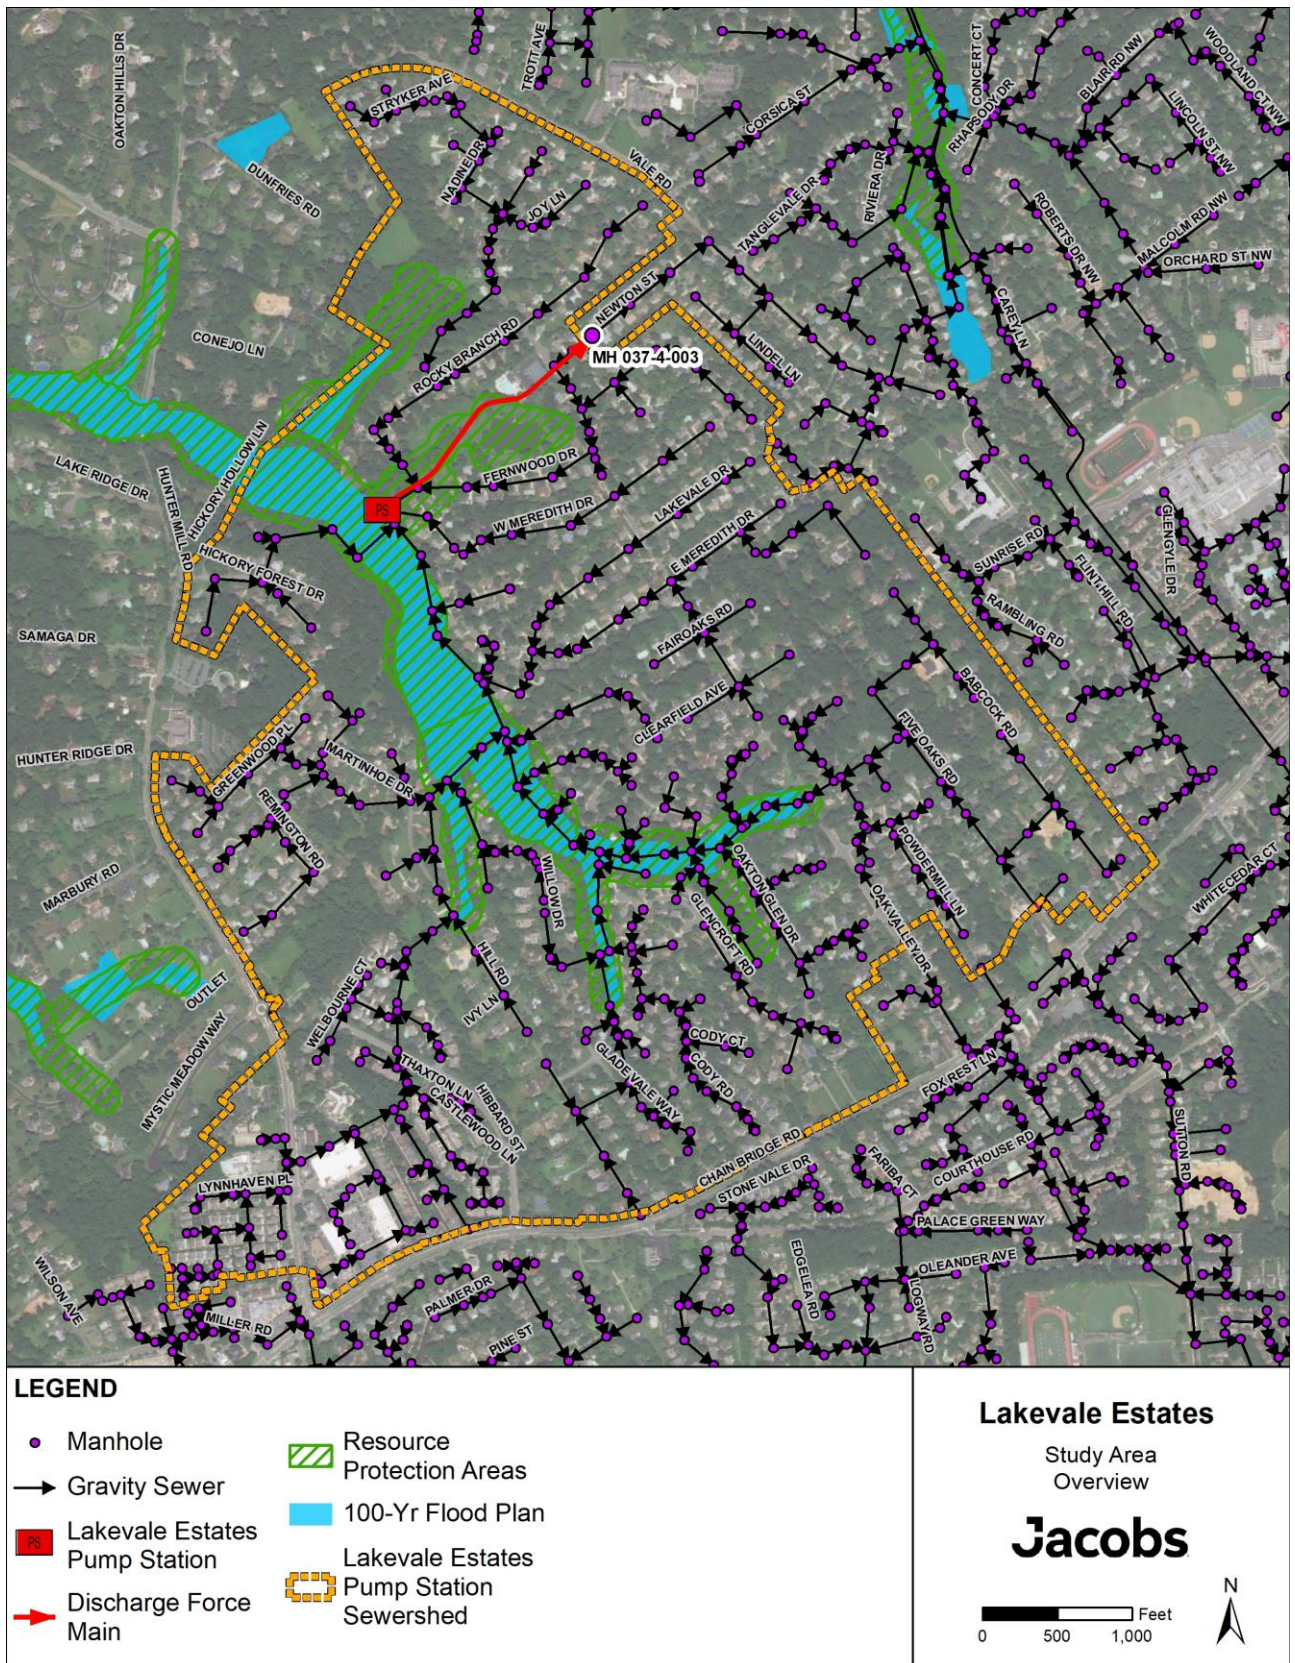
Lakevale Estates Pump Station Gravity System – Overall Site Plan
